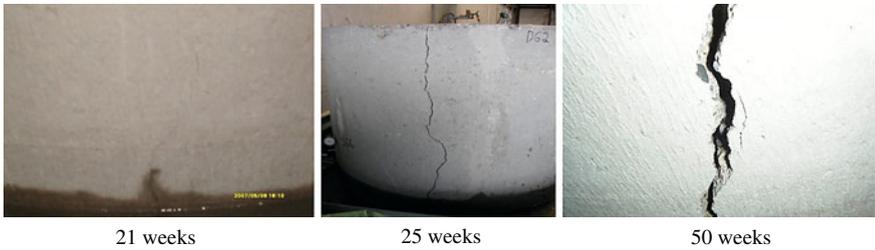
Progression of vertical crack in concrete manhole ring in 21, 25 and 50 weeks. At 33 weeks it was 12 mm wide
